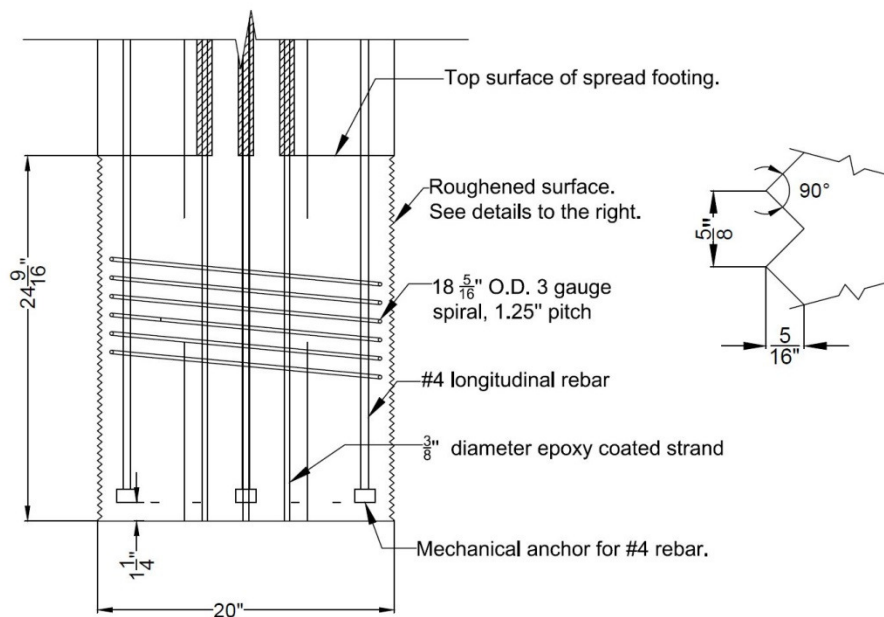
Example footing socket connection detail (Finnsson, 2013).
